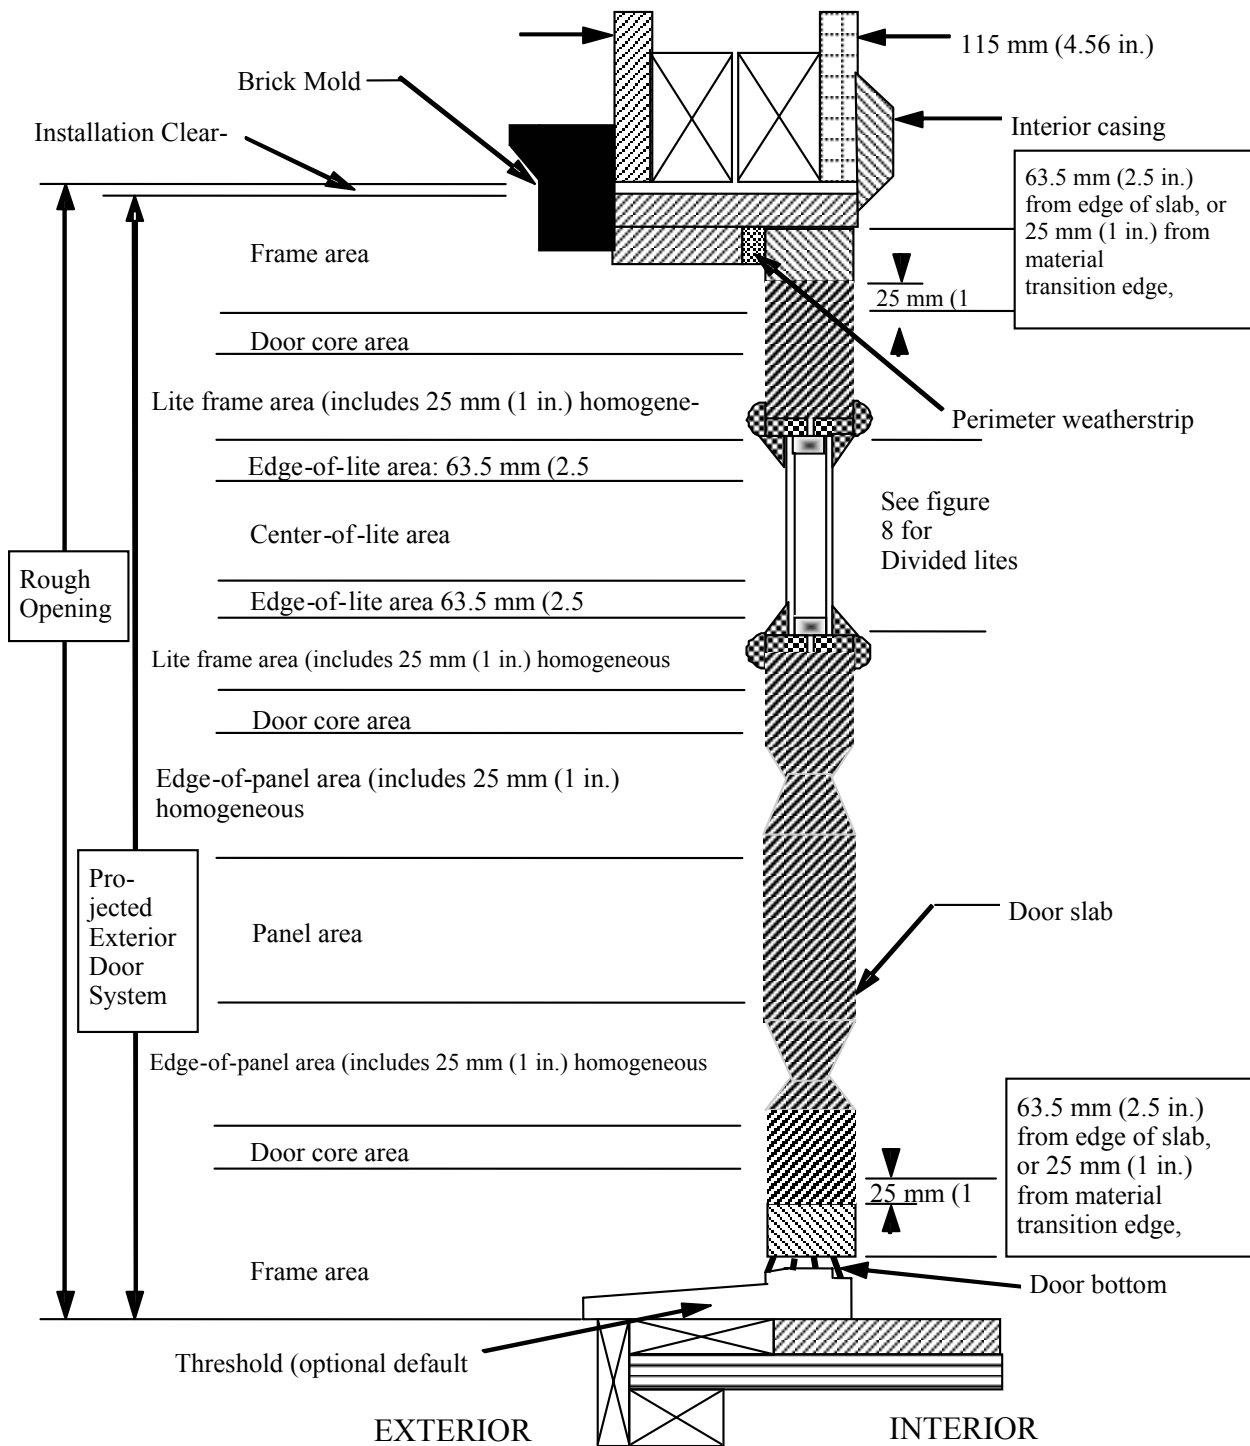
Exterior Steel/Composite Door System Area Schematic — Vertical Elevation
